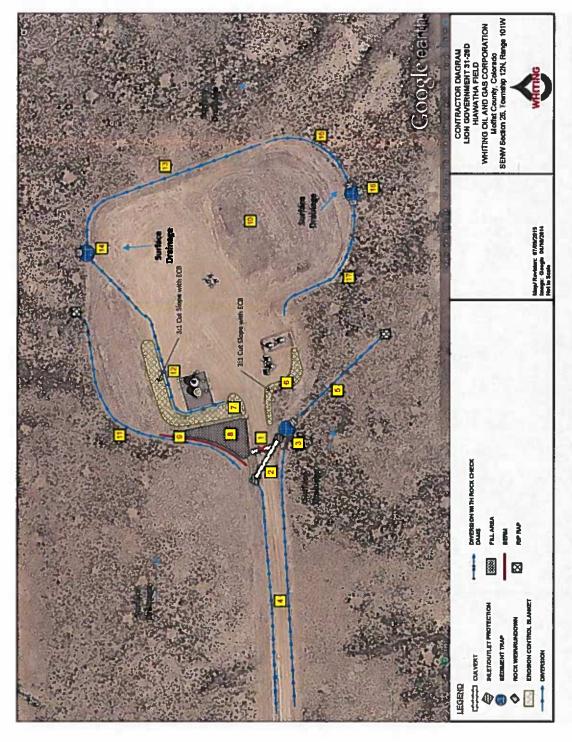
Diagram depicting stormwater features proposed for construction on Lion Government 31-26D.
